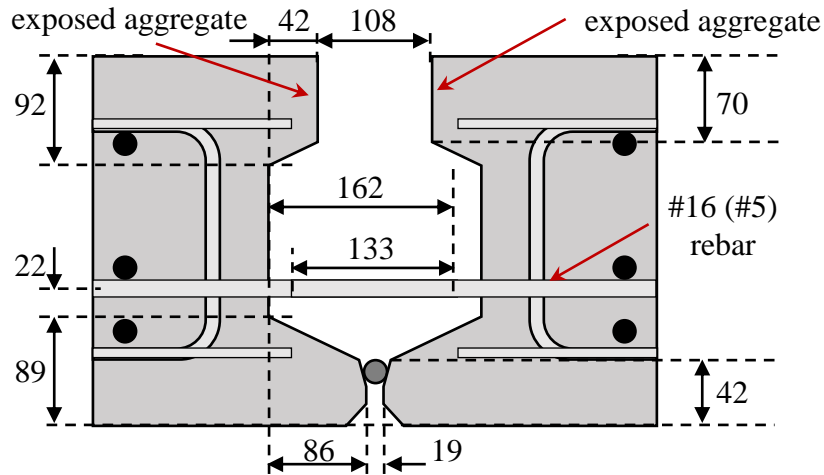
Proposed joint geometry based on small-scale joint testing and two-beam system tests (units: mm, 1 mm = 0.0394 in.)
